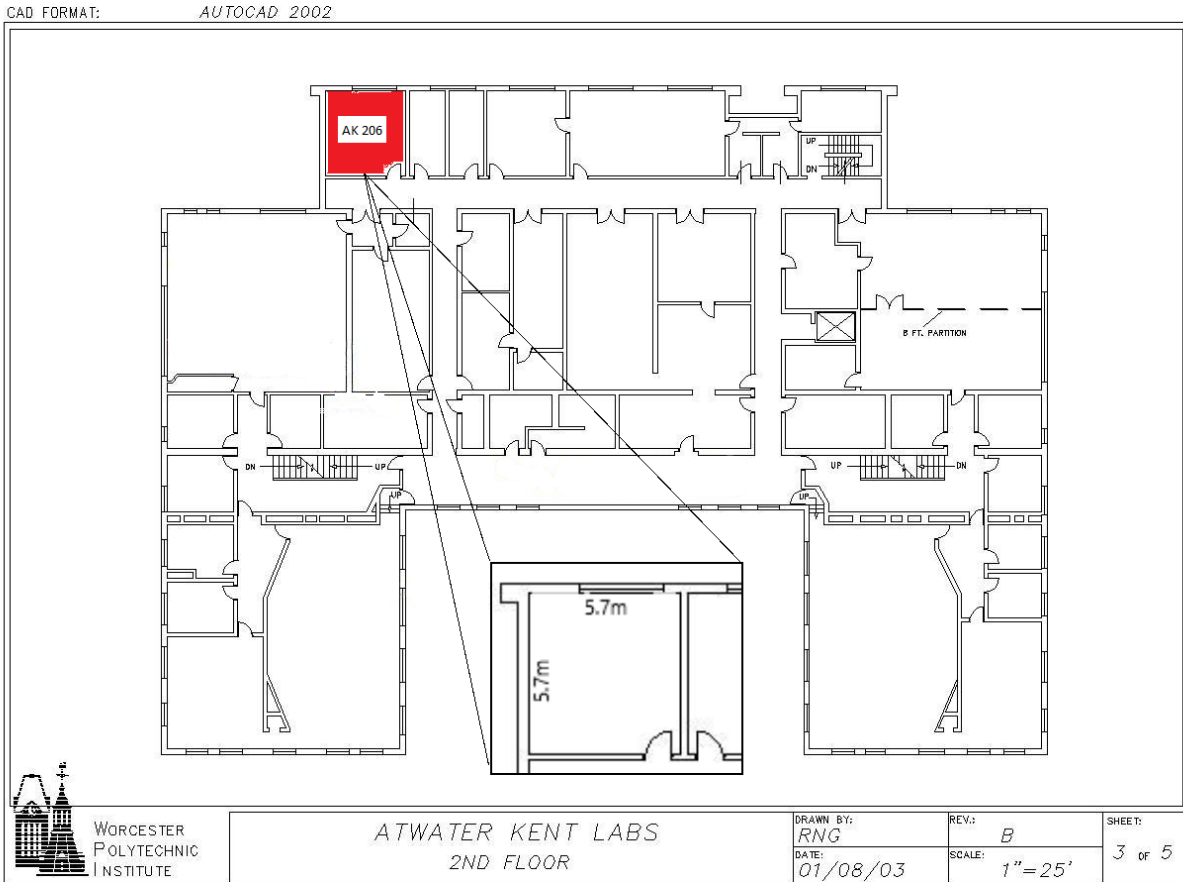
Atwater Kent building floor plan, highlighting room ak206 in the top right corner and providing room dimensions in the expanded view at bottom center
